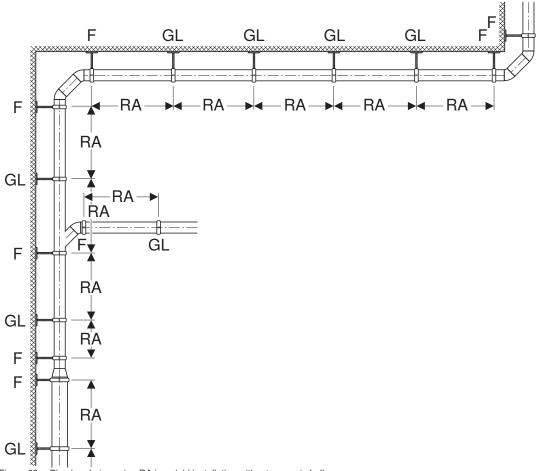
Pipe bracket spacing RA in a rigid installation without support shells
